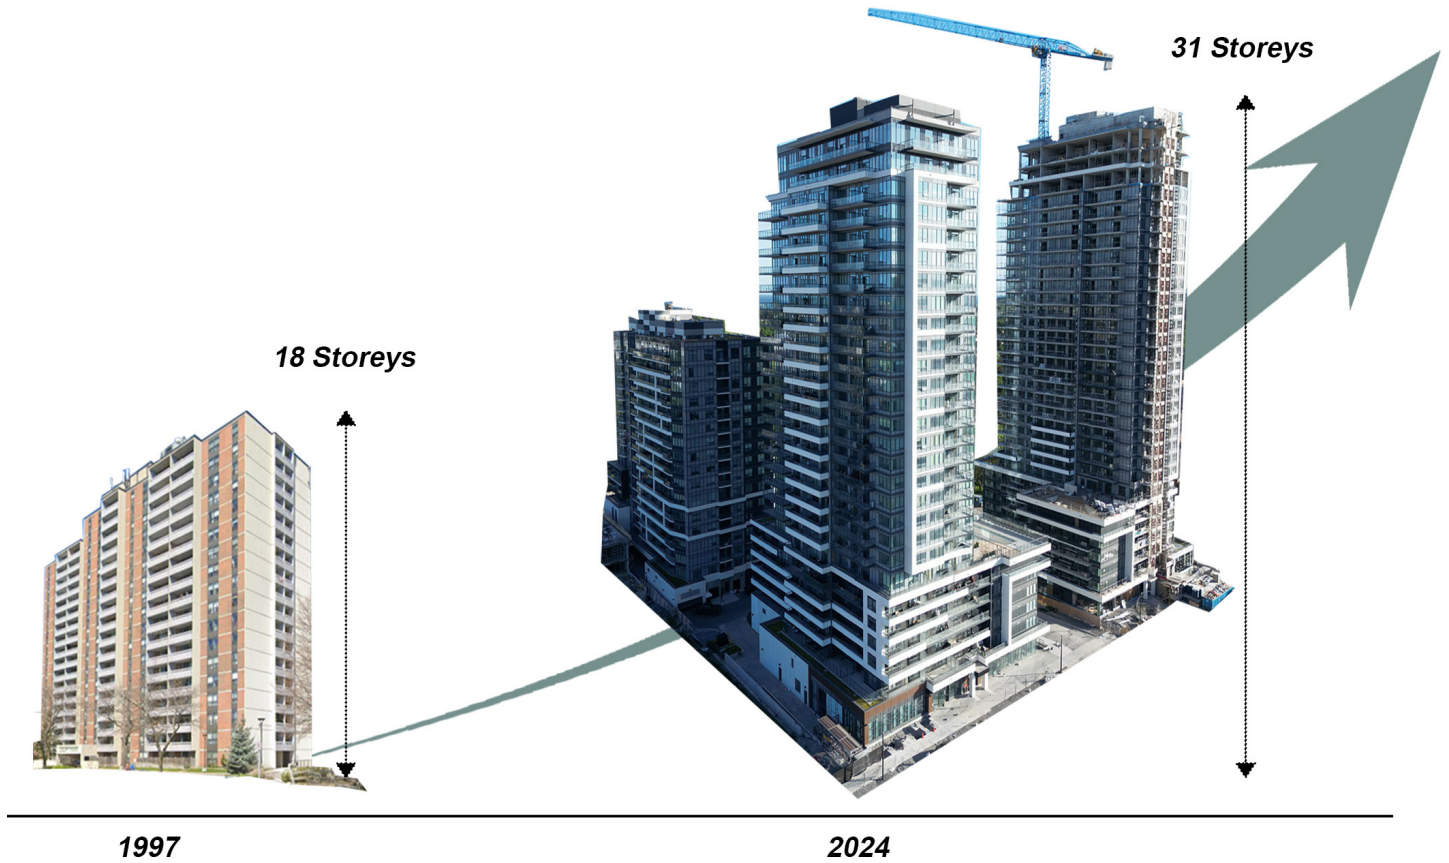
Height comparison between Radom Street apartments and Universal City, Pickering
